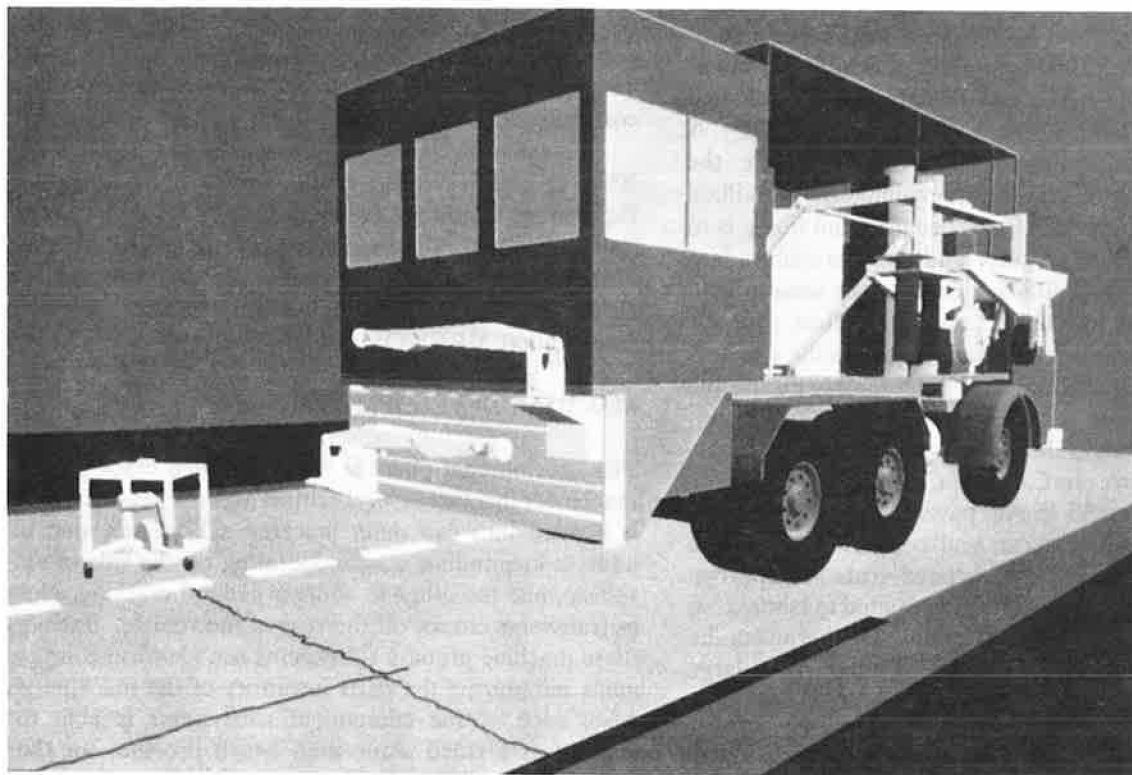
Computer generated pavement crack and joint sealing machine.
